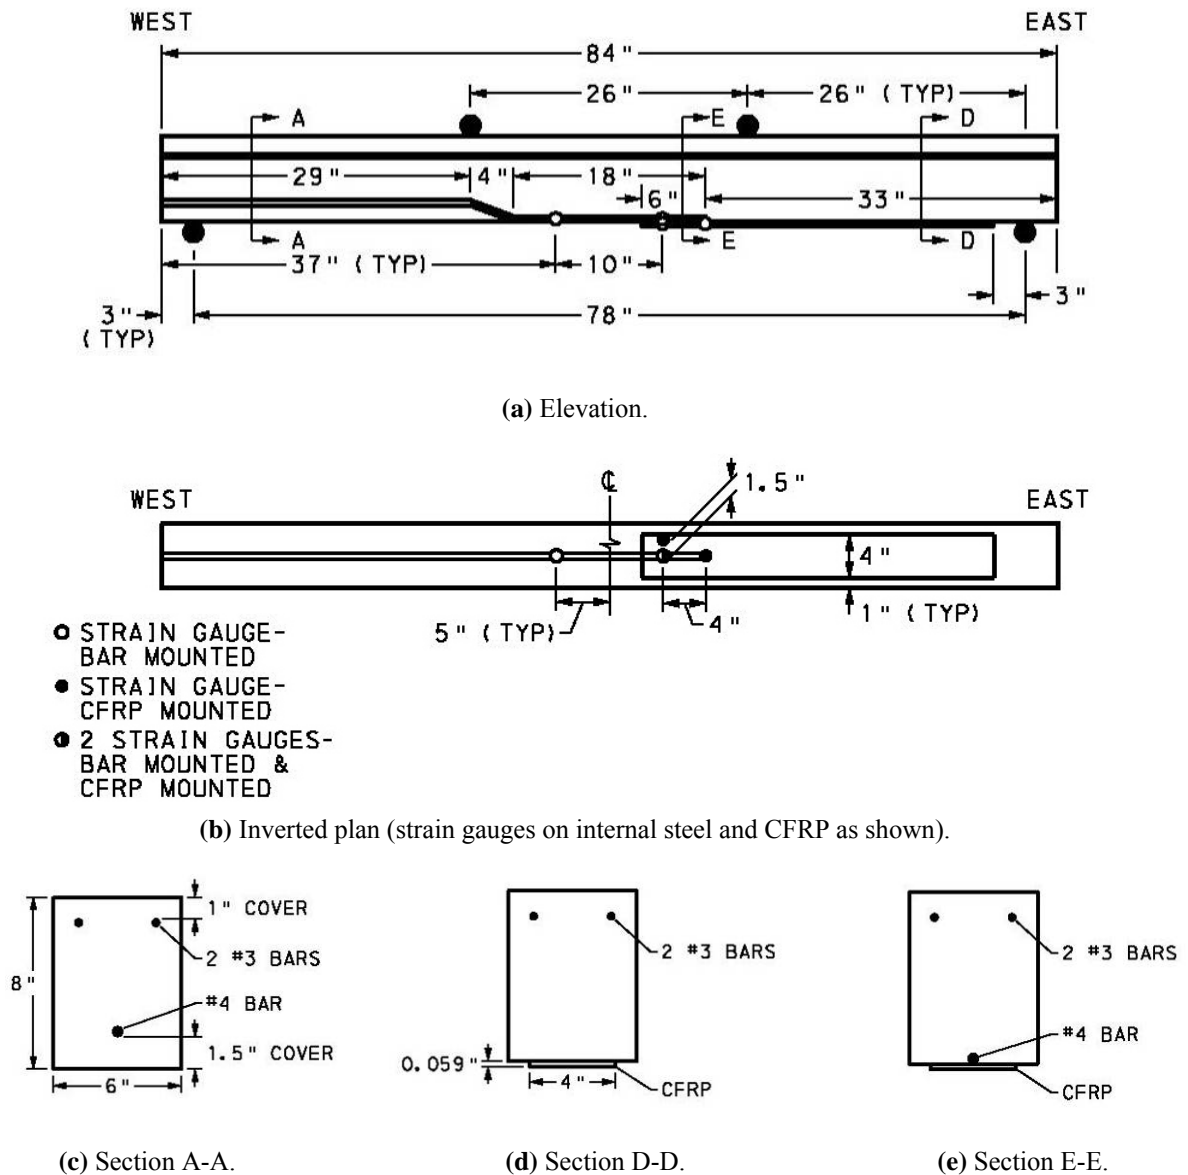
Beam S-6-B having contact CFRP-rebar splice.
